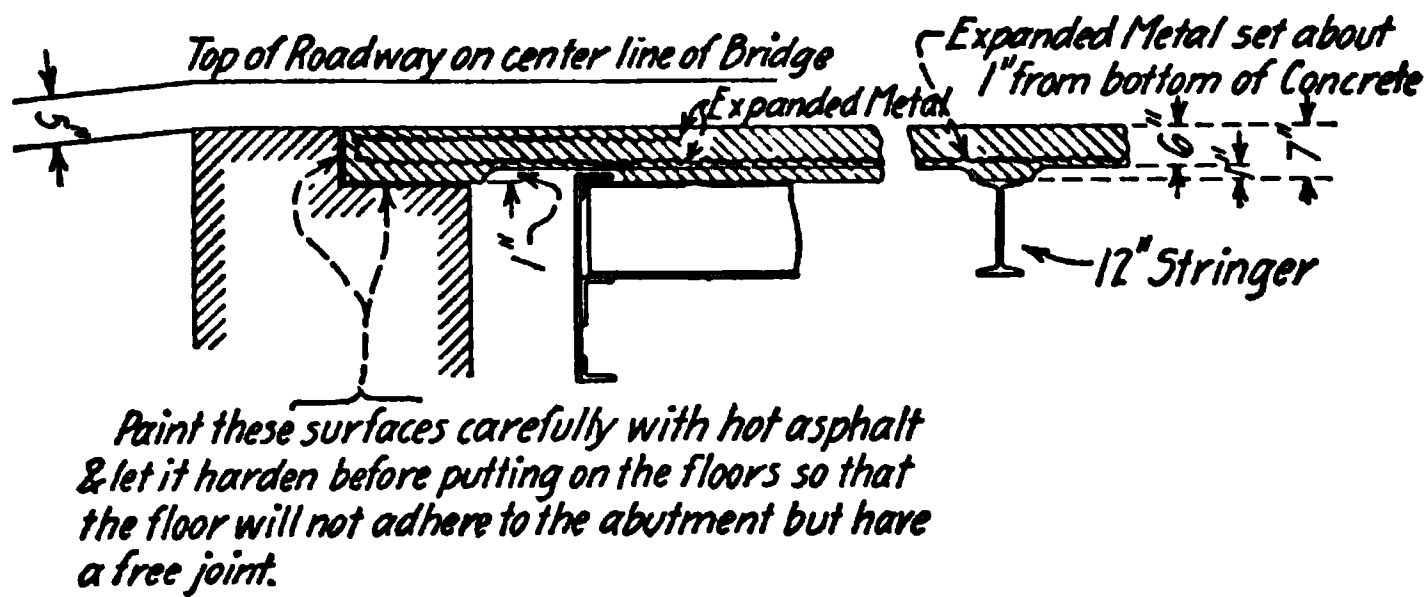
DETAIL OF FLOOR OF HARRISON STREET PLATE GIRDER BRIDGE, PRINCETON, N. J. (AMERICAN BRIDGE CO.)
